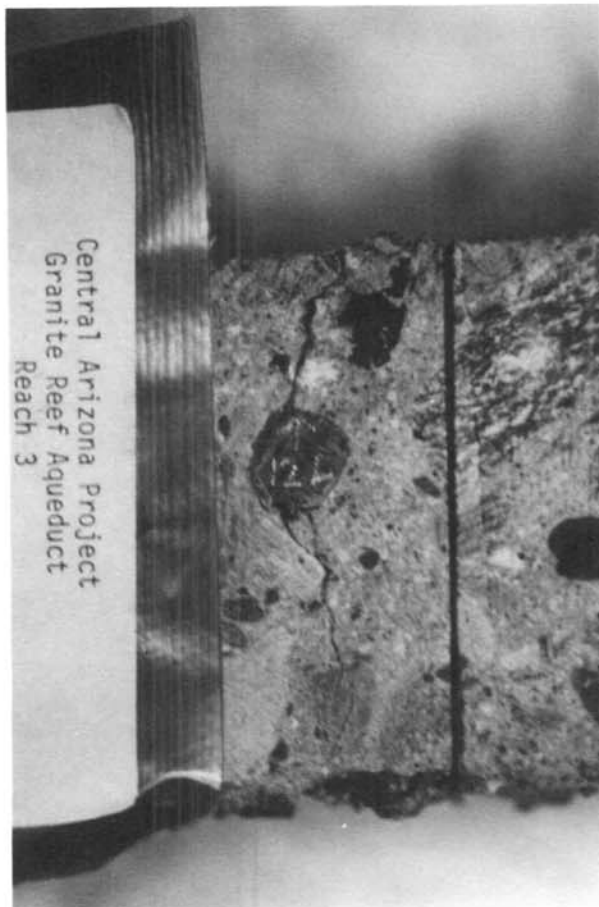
Opposite end of view shown in Figure 3 above. Note cracking completely through section containing the longitudinal reinforcement.
